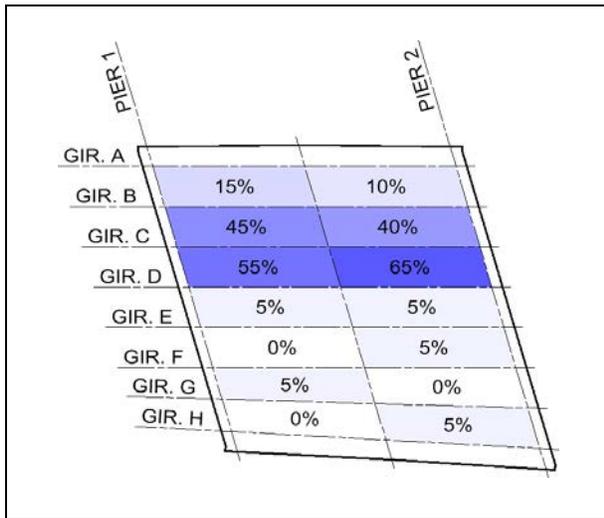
Bridge 5/302E Crack Intensity Diagram
